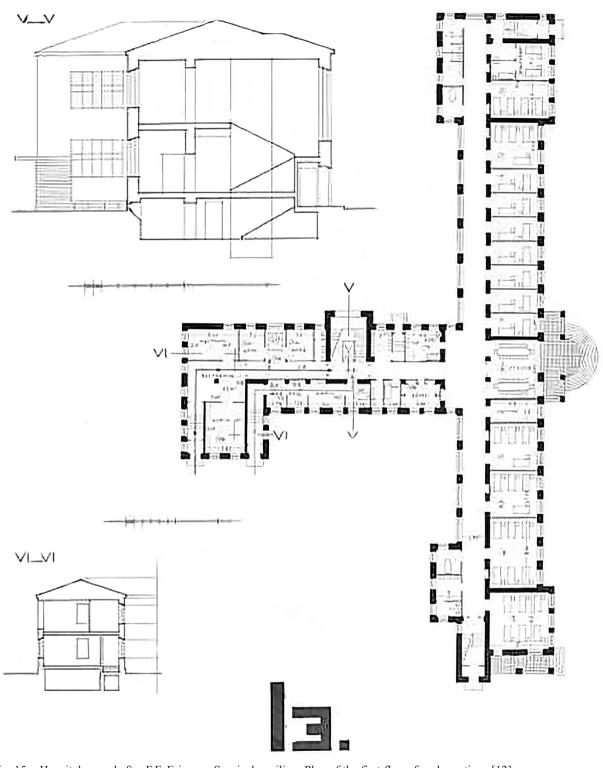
Hospital named after F.F. Erisman. Surgical pavilion. Plan of the first floor, facade sections [12]Рис. 15. Больница им. Ф.Ф. Эрисмана. Хирургический павильон. План первого этажа, разрезы фасада [12]
